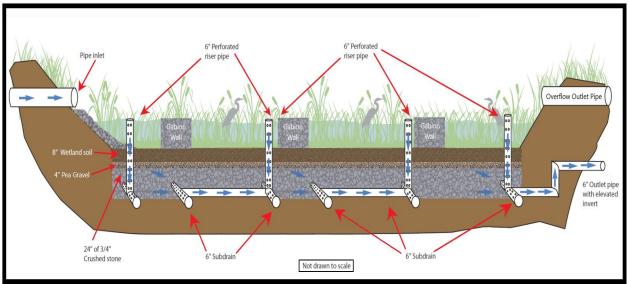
UPRRP Constructed Stormwater Wetland Design Cross Section
